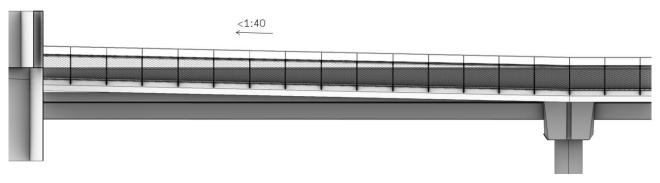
Elevation diagram showing footway gently ramp up to meet active travel path at abutment
